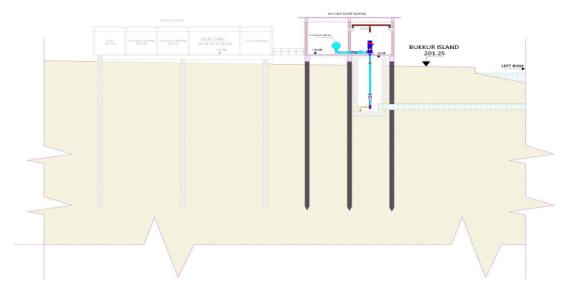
Construction of New IPS on Shore (over River Bank/Island)
